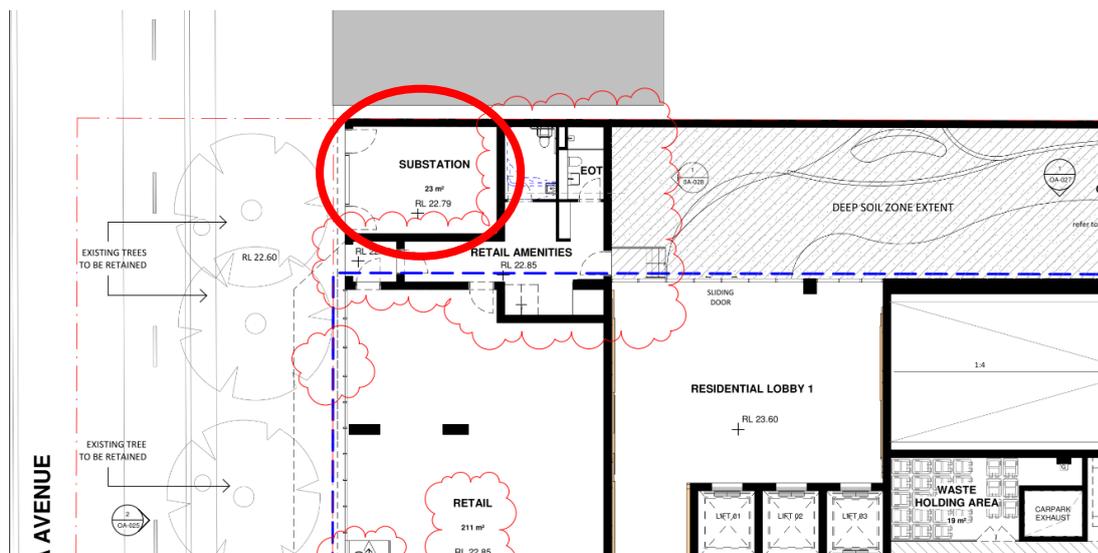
The amended ground floor plan with the substation fronting O'Dea Avenue and the proposed location of the through-site link converted to communal open space
